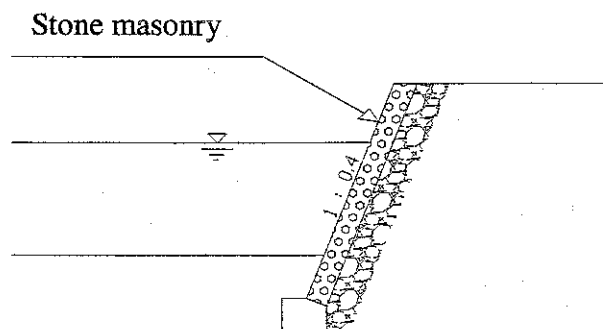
Stone Masonry Revetment (1:0.4)
